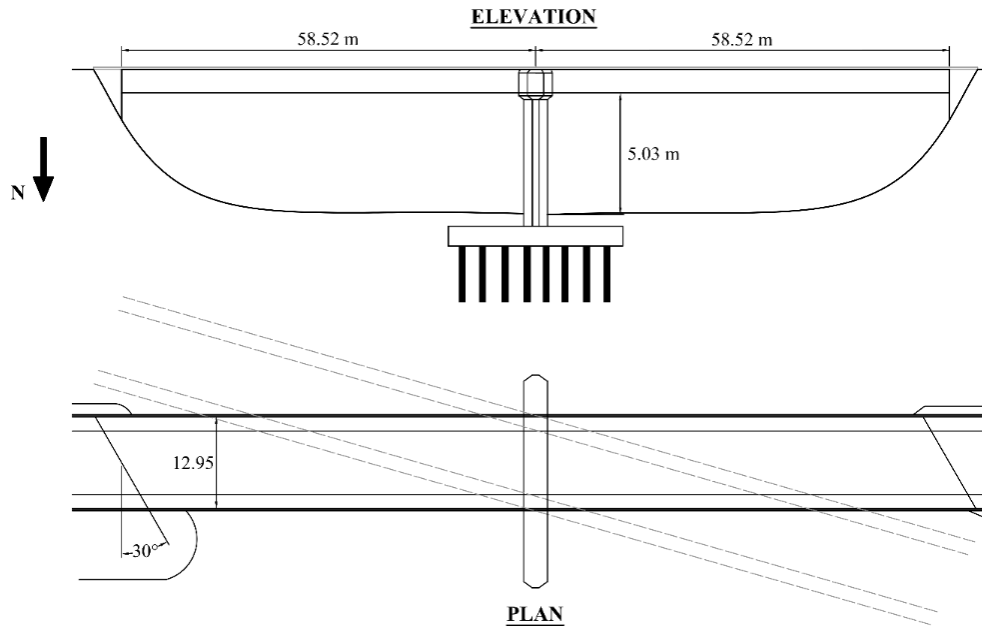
Elevation and plan view of the highway bridge, adapted from Agrawal et al. (2009).
